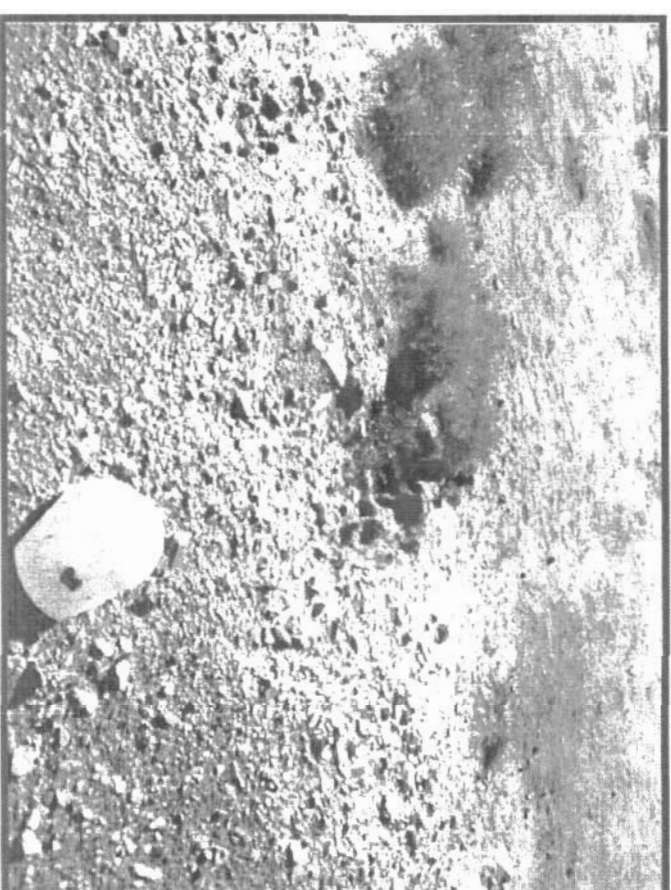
shows a significant erosional gully located on the downstream toe. This gully is located some 40 m south of the north abutment.
